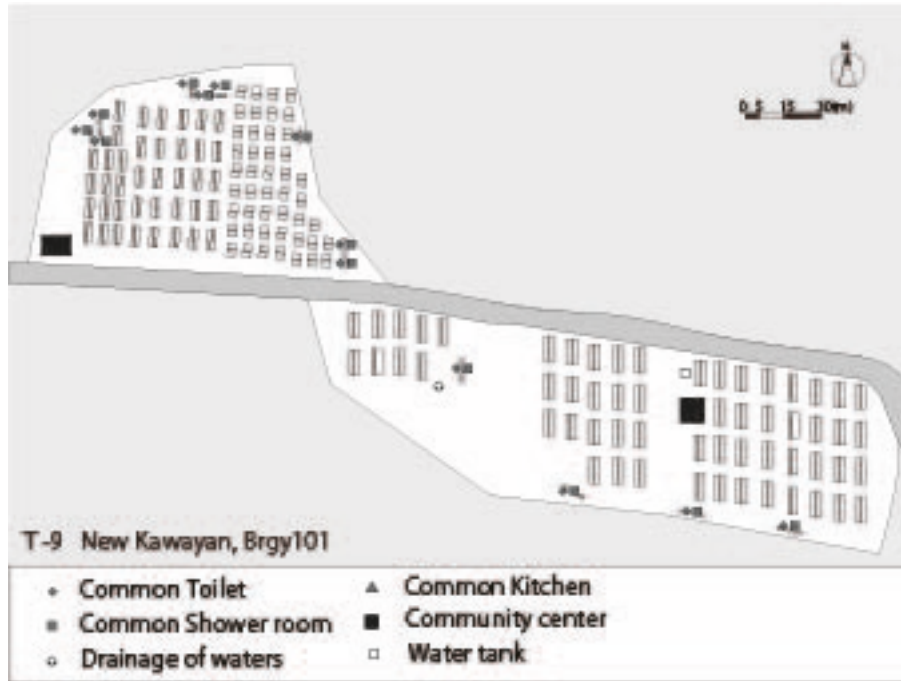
15: Site Development Plan of T9 – New Kawayan
